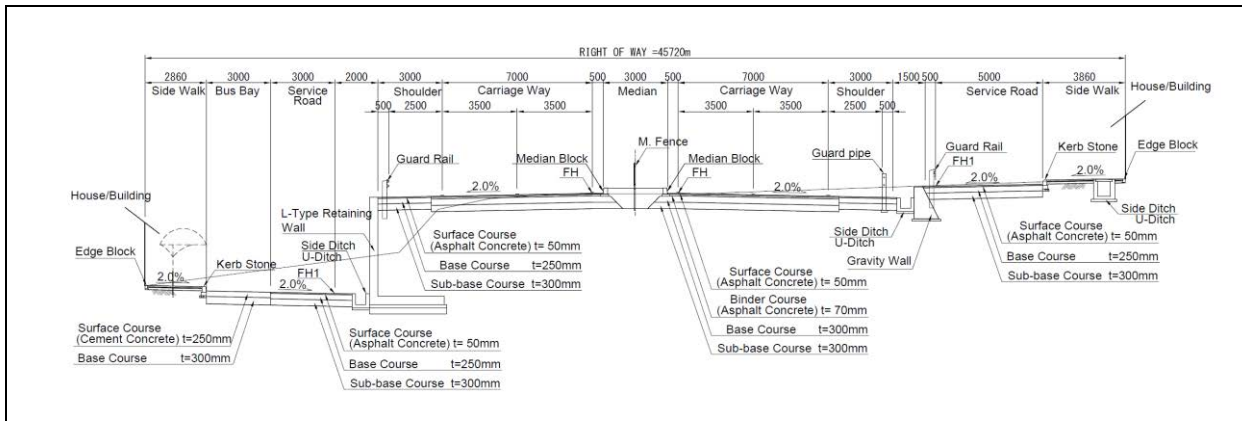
Typical Cross Section (Start Point - Jagati)
